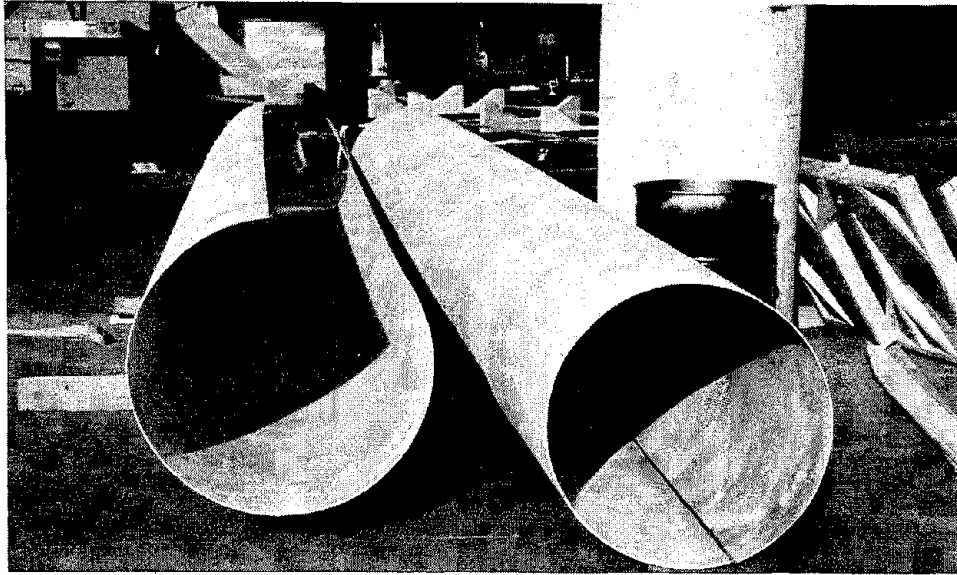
Prefabricated Epoxy-Fiberglass Shell (Snaptite System)
